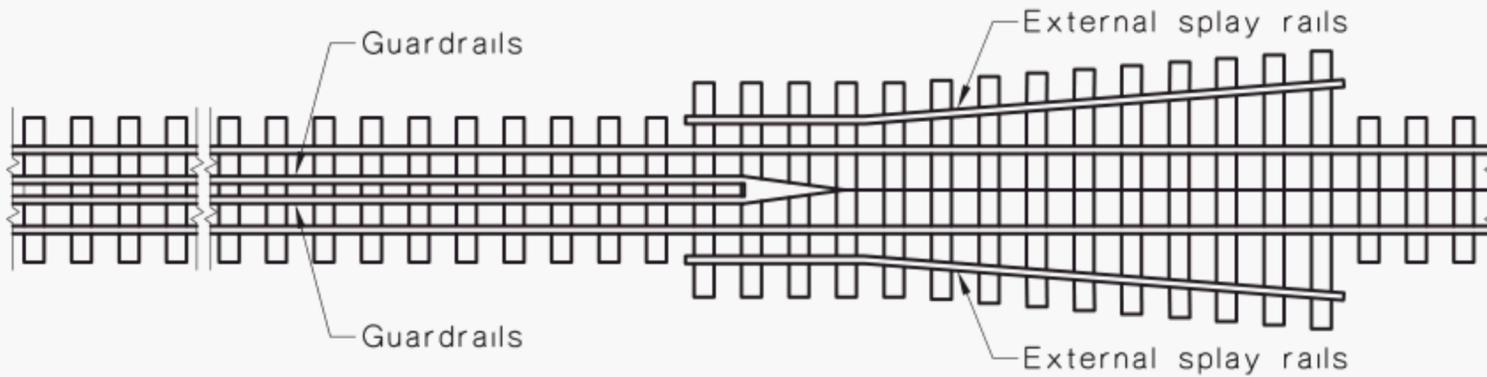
TYPICAL SPLAY RAILS AND GUARDRAILS
